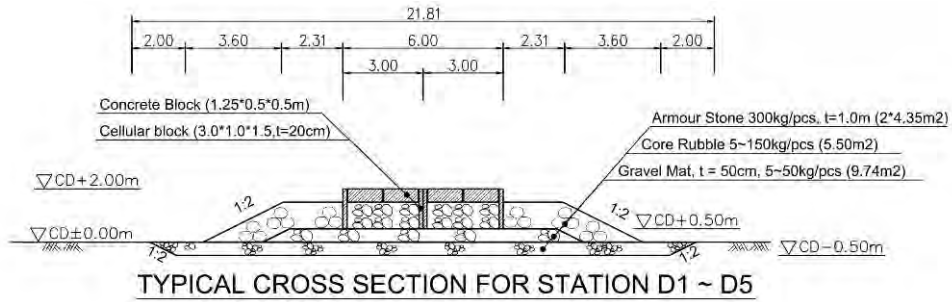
Typical Cross Section of Proposed Sand Protection Dyke – CASE B-1
